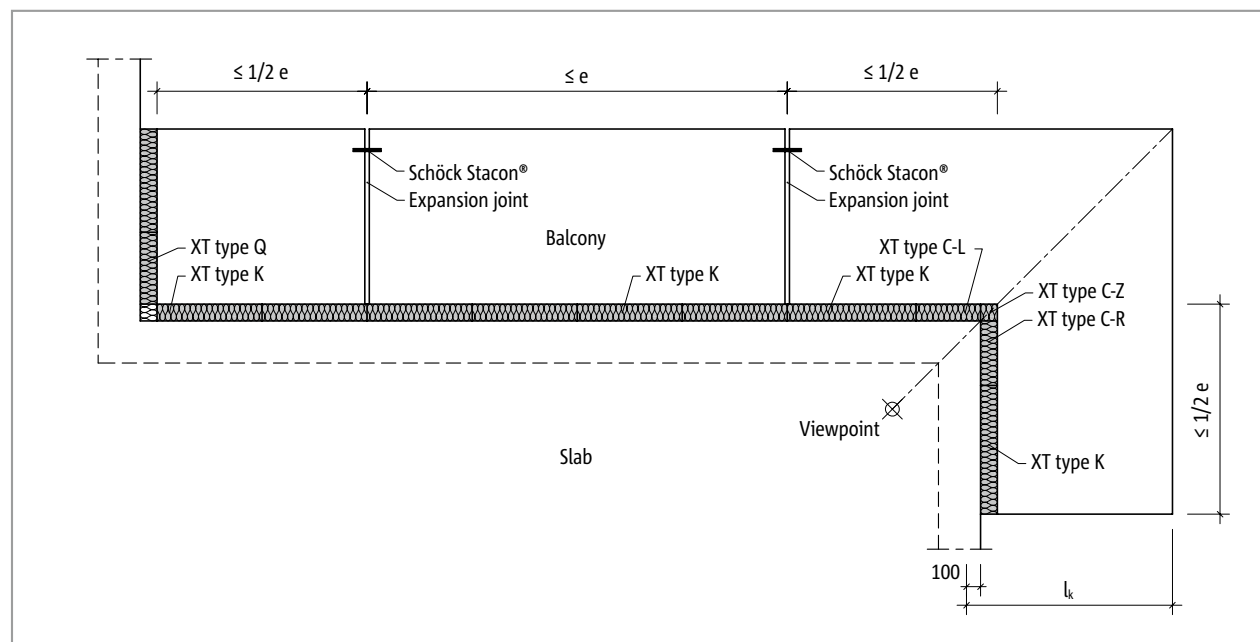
Schöck Isokorb® XT type C: Expansion joint arrangement
